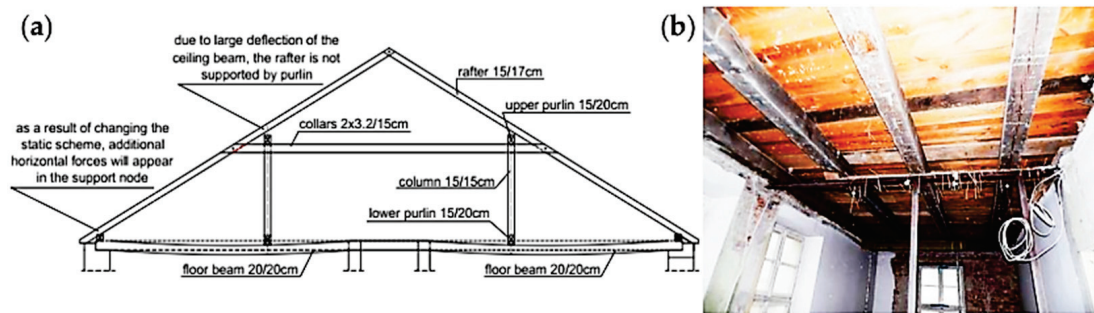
Deformation of a ceiling with wooden beams: (a) roof truss structure supported on the deformed ceiling and (b) view of the ceiling temporarily supported in order to limit the deflection.
